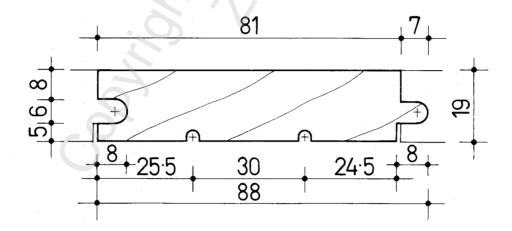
100 mm x 25 mm TONGUE AND GROOVE FLOORING (full size)
